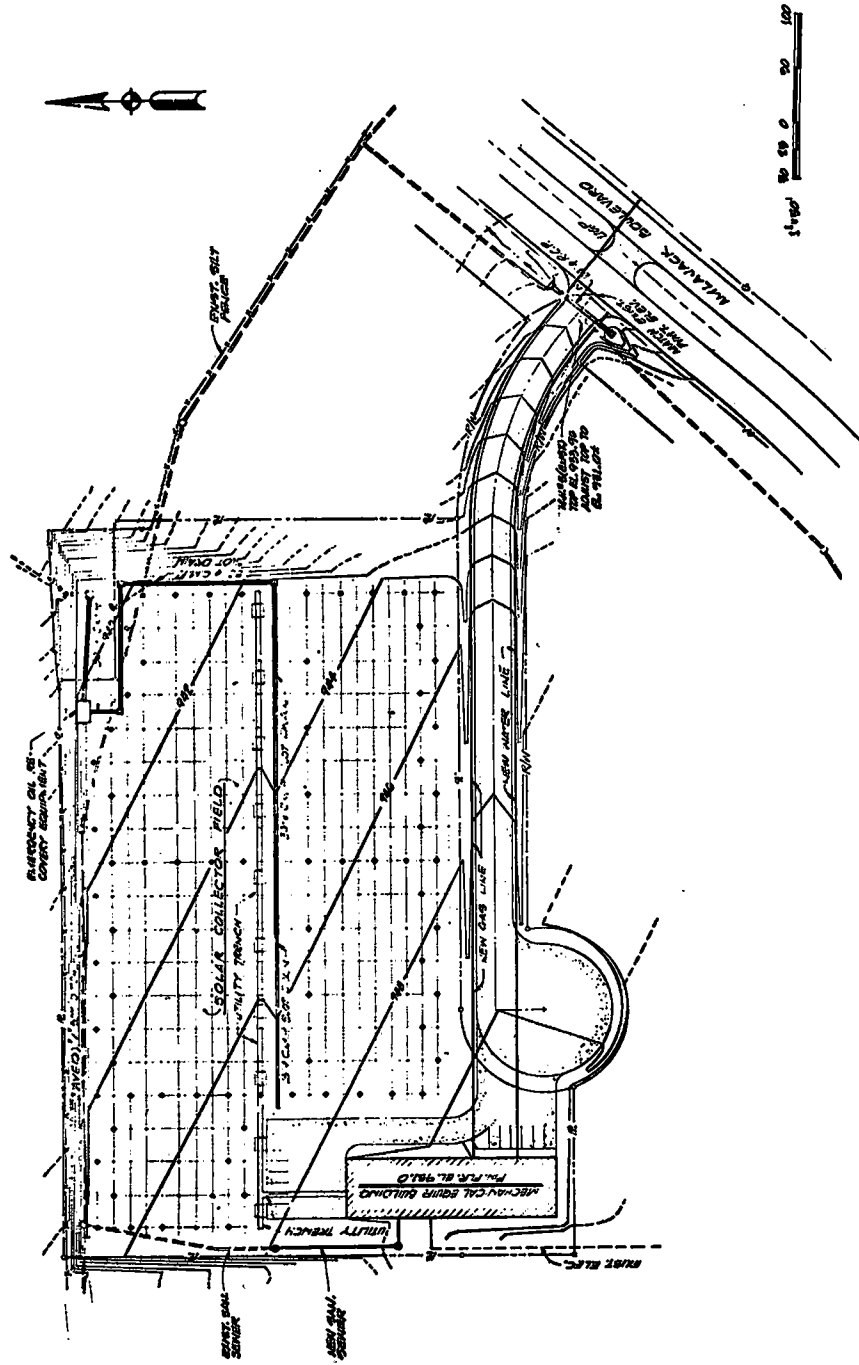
Site Interface and Control Drawing, Grading and Drainage Plan
